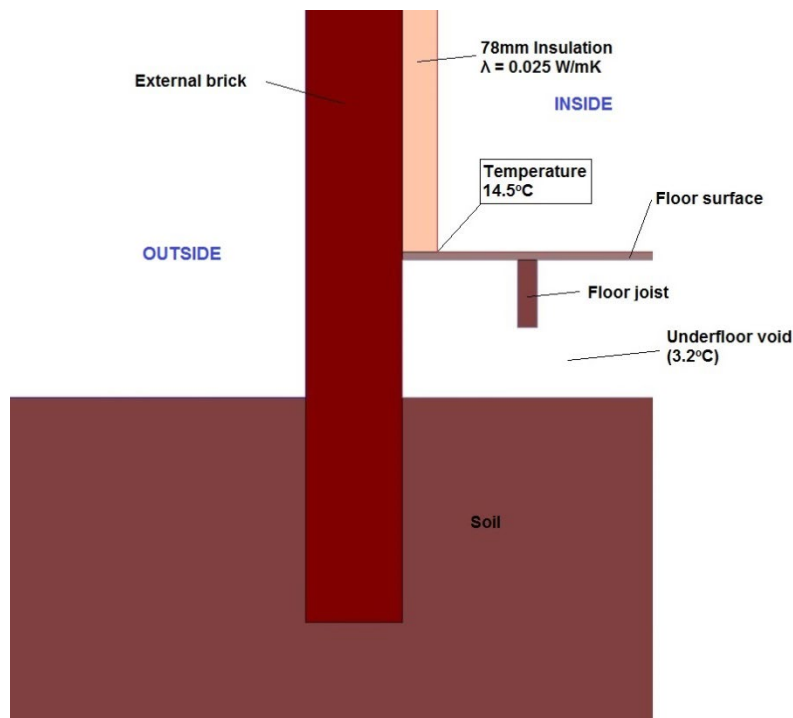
Junction between an uninsulated suspended ground floor and a wall with internal insulation (typology R8) with no junction insulation
